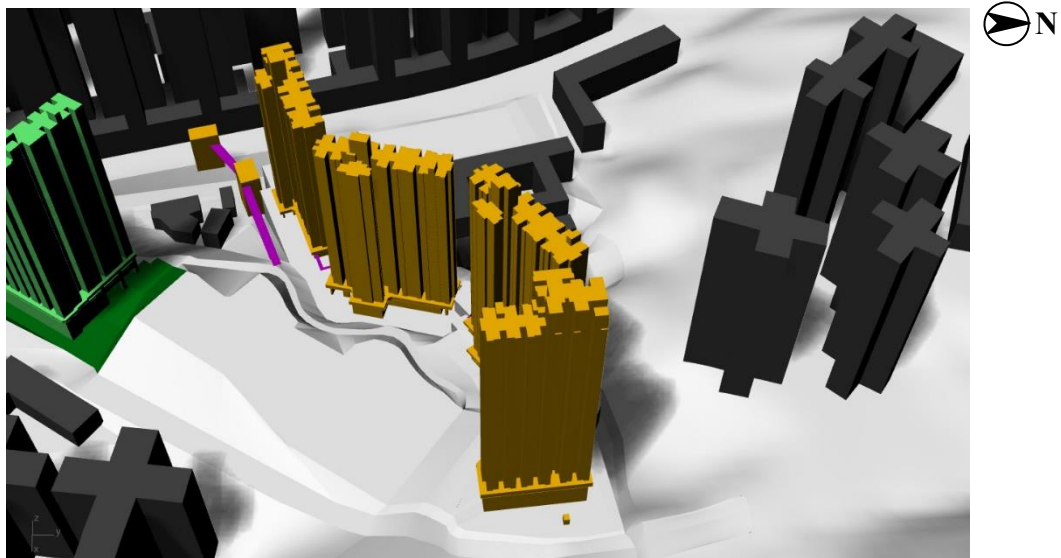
Easterly View of Planned Development Pik Wan Road Site A (Orange)
